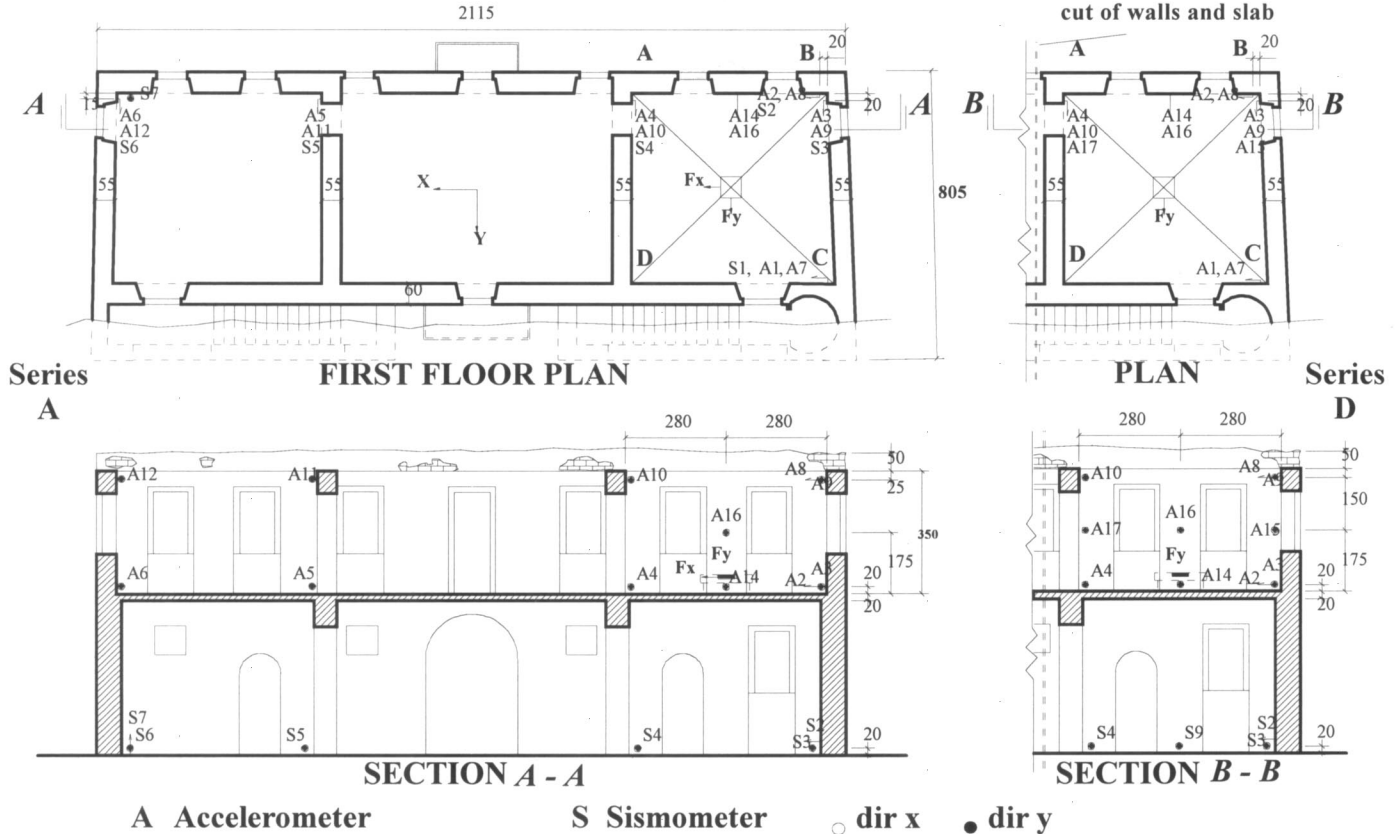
Plan and sections of the house. Location of instruments in test series A and D
